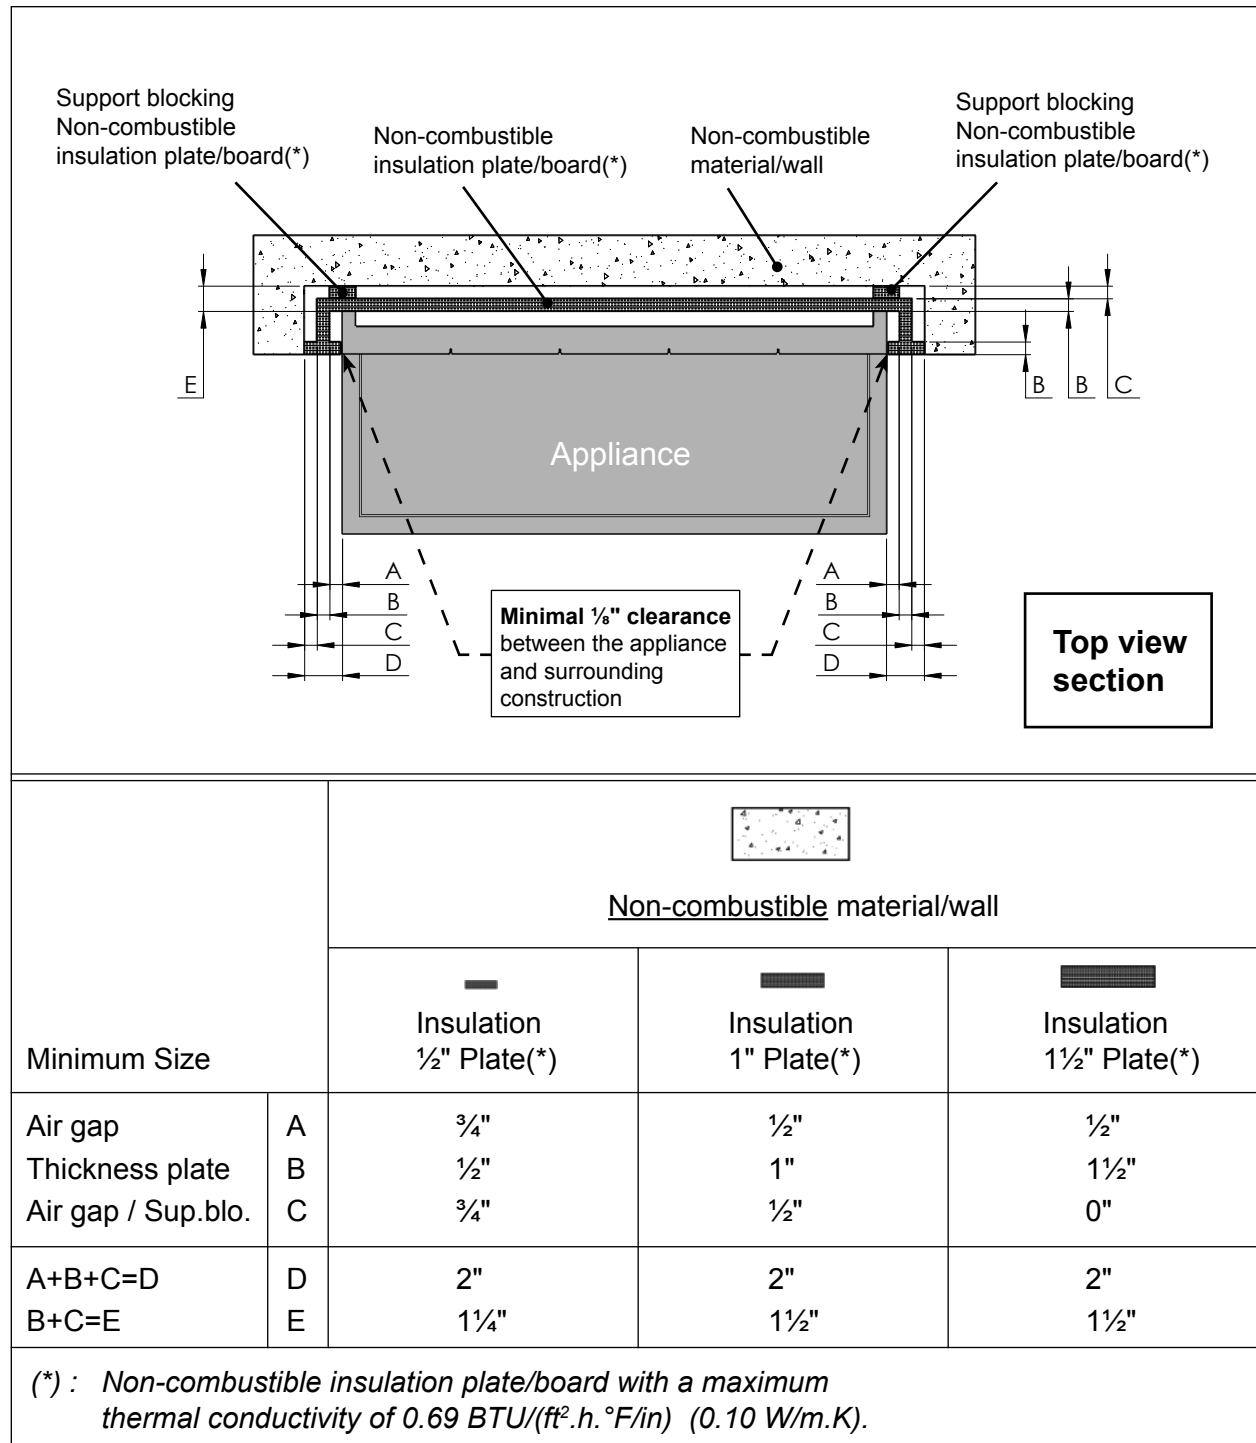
Clearances to non-combustible sides & The minimum required thickness of the non-combustible plate/board(*)
